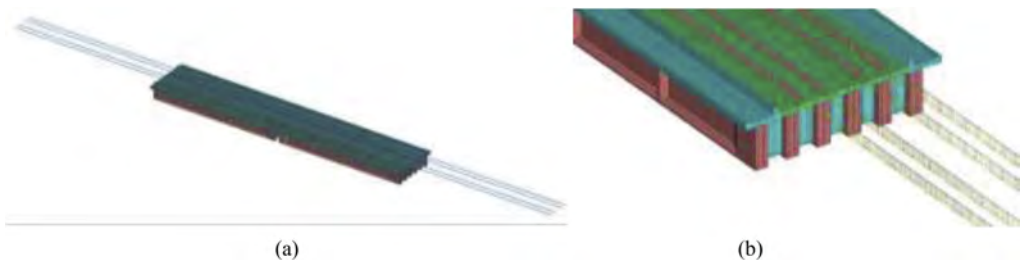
Modeling of railway tracks and interaction of adjacent bridge decks: (a) isometric view of two adjacent spans with railway tracks; (b) detail of the railway track-bridge deck connections.
